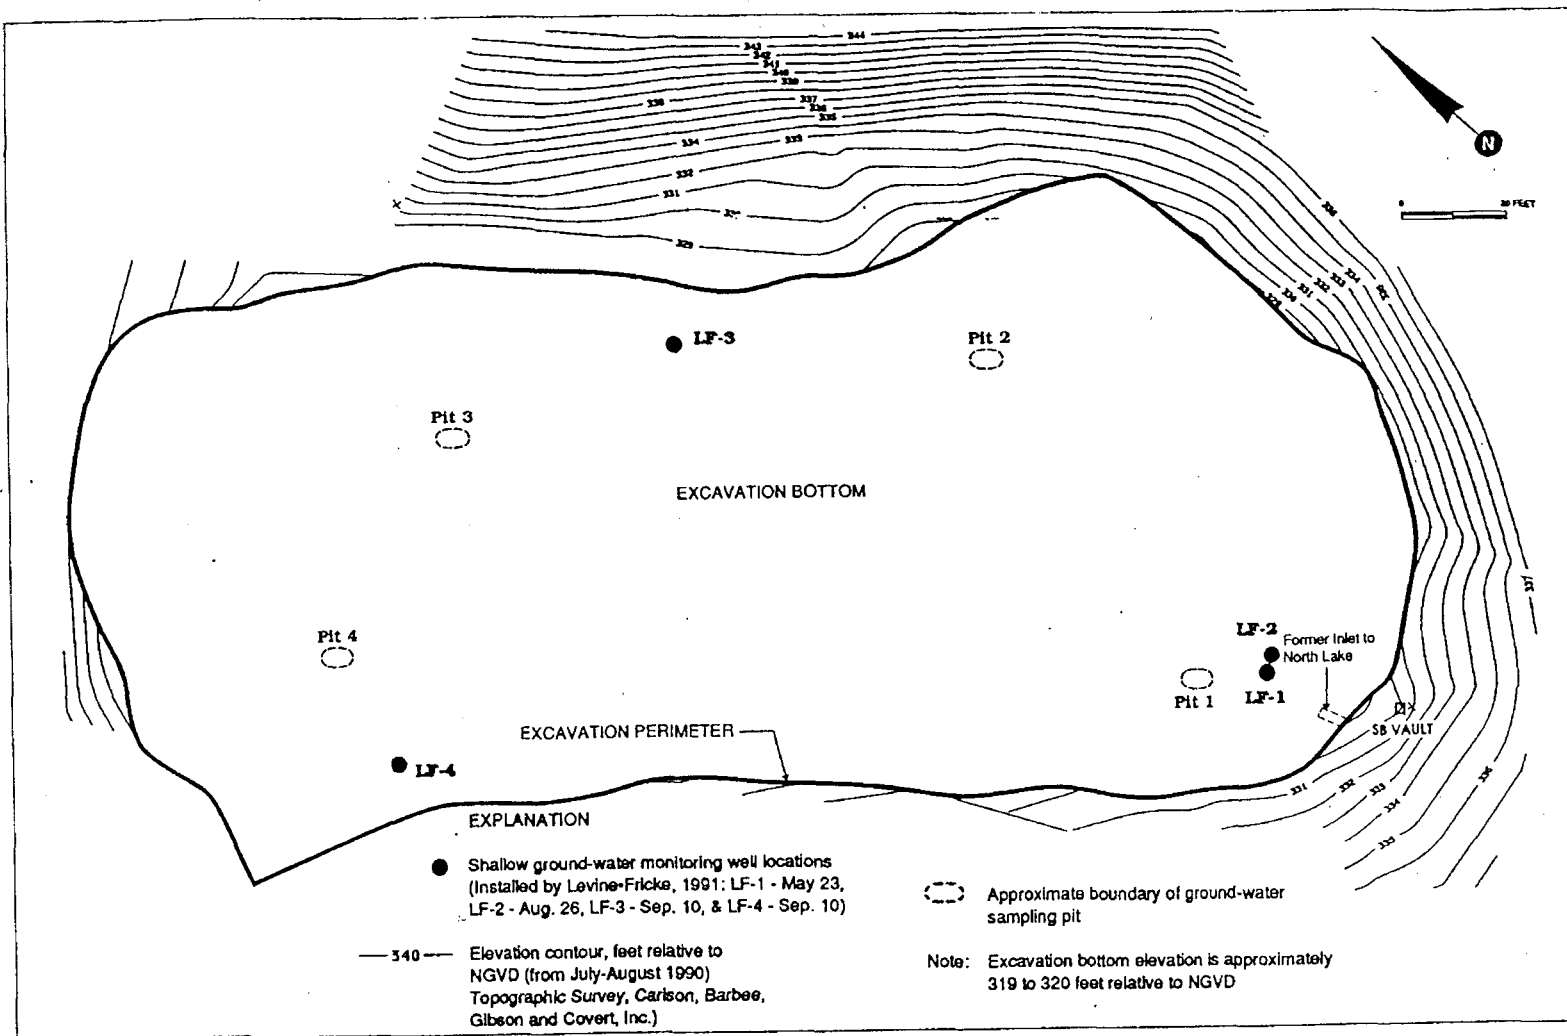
PLAN OF NORTH LAKE SHOWING GROUND-WATER SAMPLING LOCATIONS
